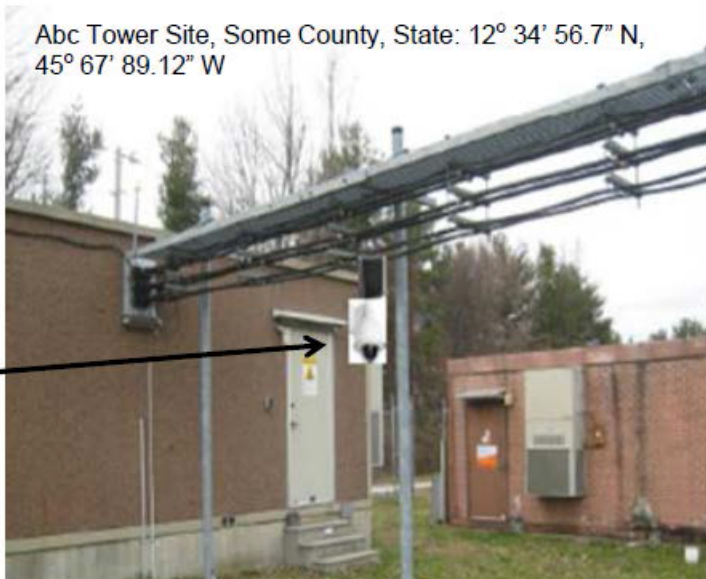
Ground-level photograph with graphic showing proposed equipment installation.
